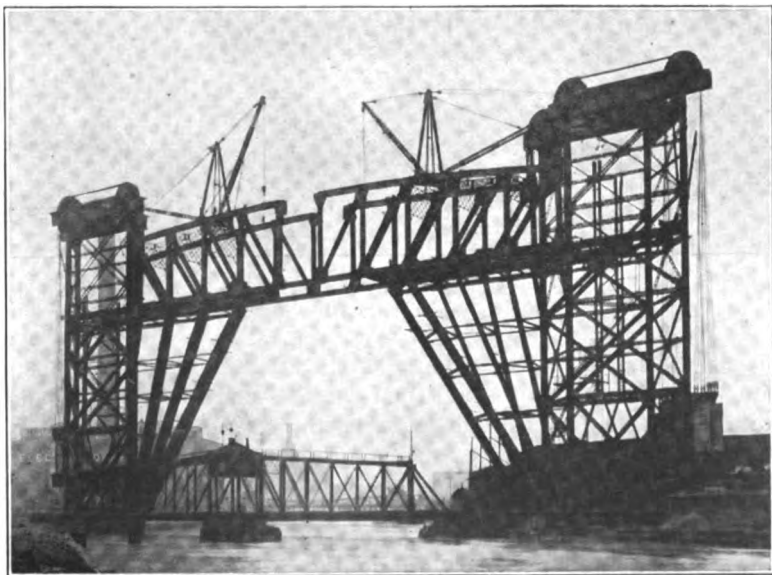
Showing Trusses of Lift Span Completely Assembled, Except Chord and Diagonals in One Panel.
